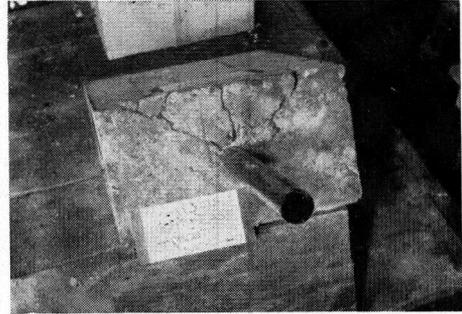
Typical Failure of 1 1/4-in. Dowel.
